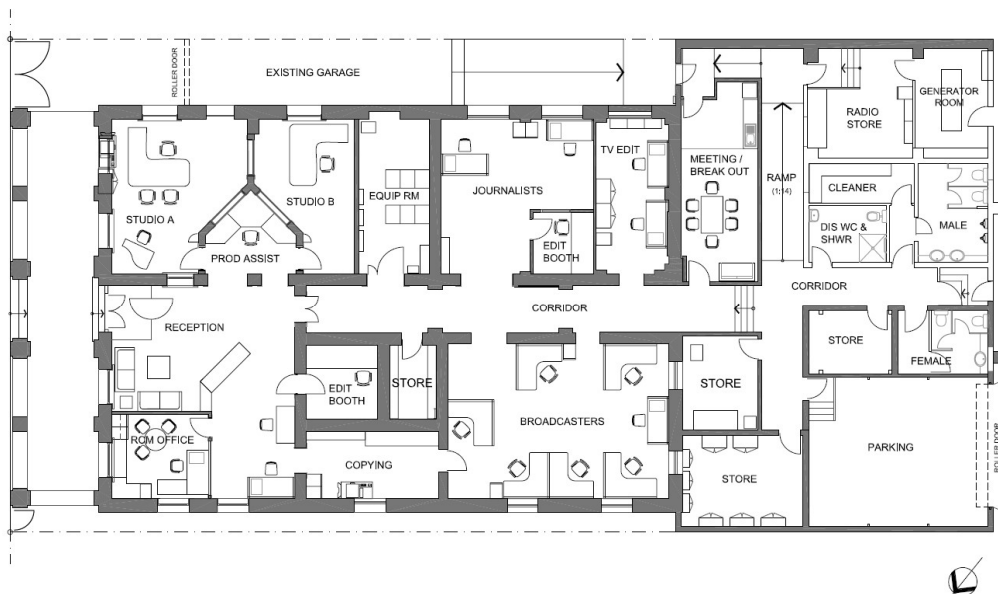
Ground Plan of the ABC Studios Building (Source: Provided by ABC Property Portfolio Team, 2011).
